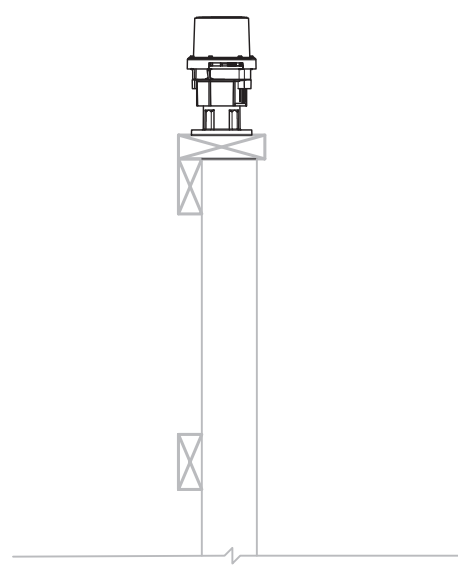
180 DEGREE RED SOLAR POWER FENDER TIP NAVIGATION LIGHT
